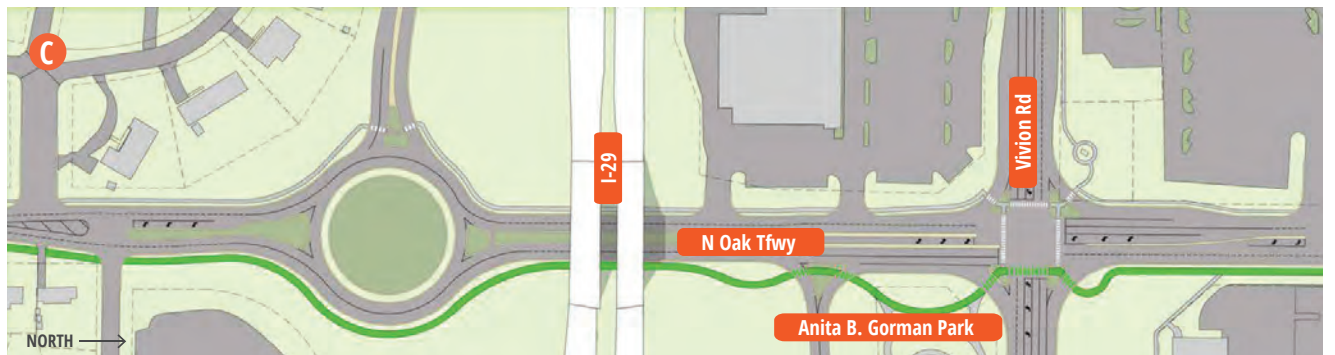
PROPOSED ROUNDABOUT AT I-29 / VIVION ROAD
